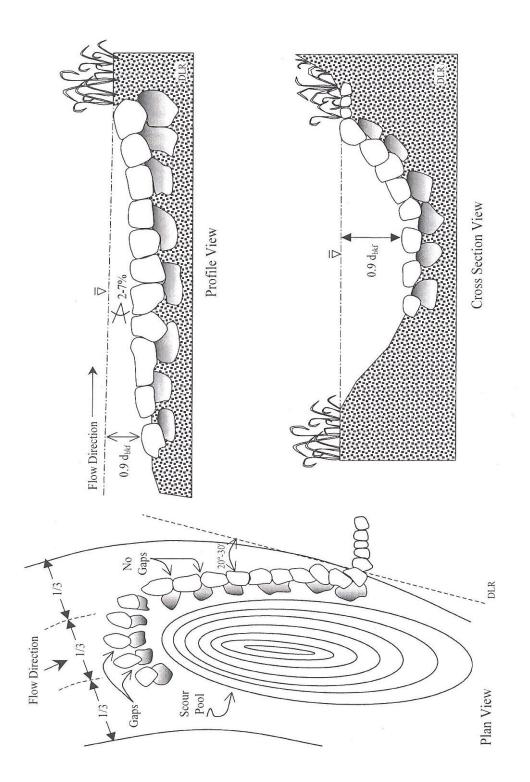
Cross section, profile and plan view of a cross-vane (Rosgen, 2001).
